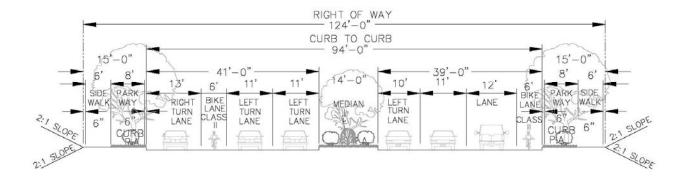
Quarry Falls Boulevard – Qualcomm Way to Franklin Ridge Road
